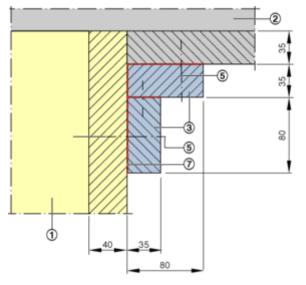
Installation detail C2: Angle section connection, damper in duct
